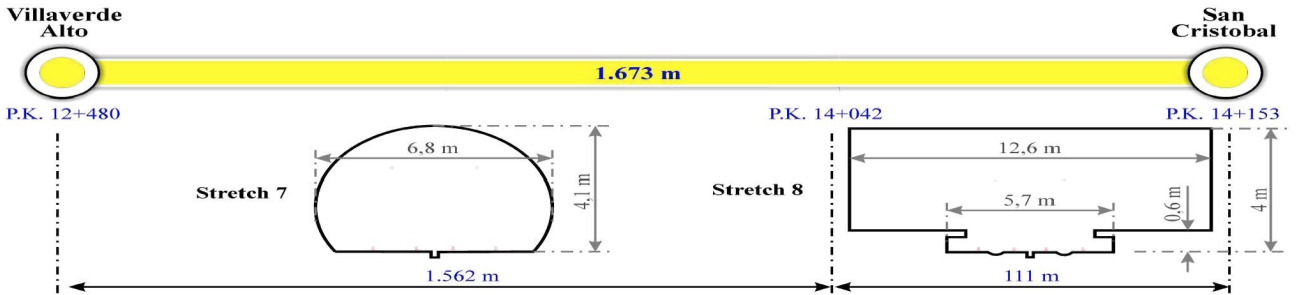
New tunnel cross sections (Villaverde Alto–San Cristóbal).
